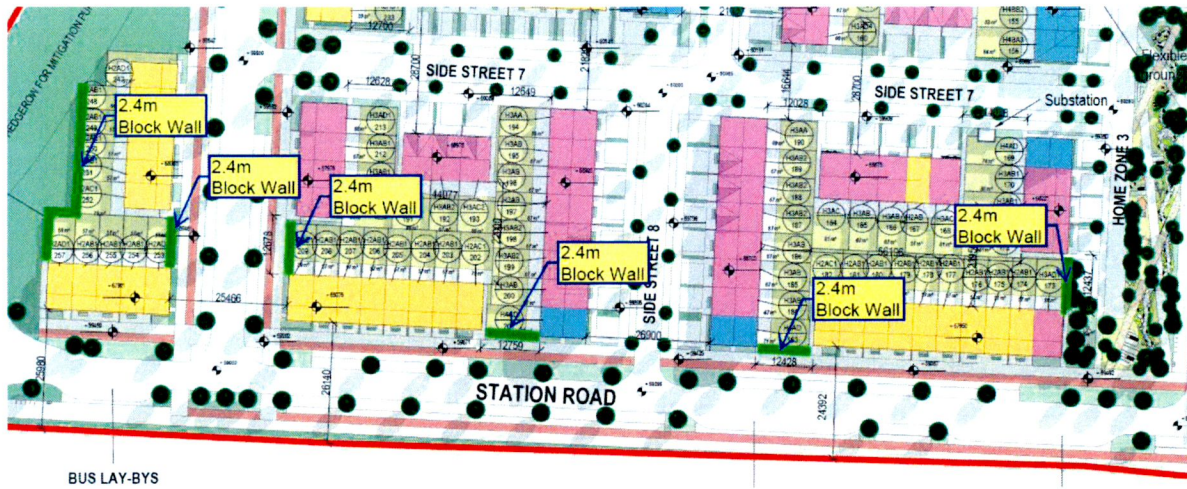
Location of recommended block wall (noise barrier) to rear gardens near the railway line
